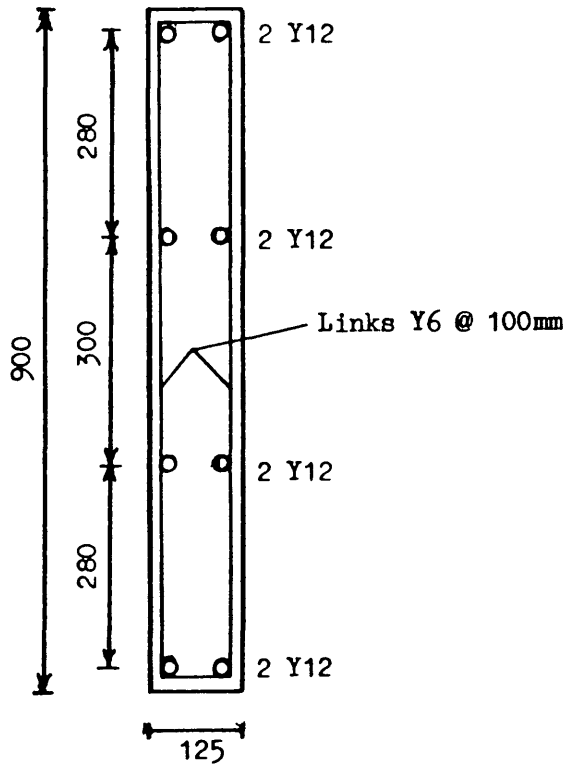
A horizontal section in the wall of model PS1 showing the reinforcing details
